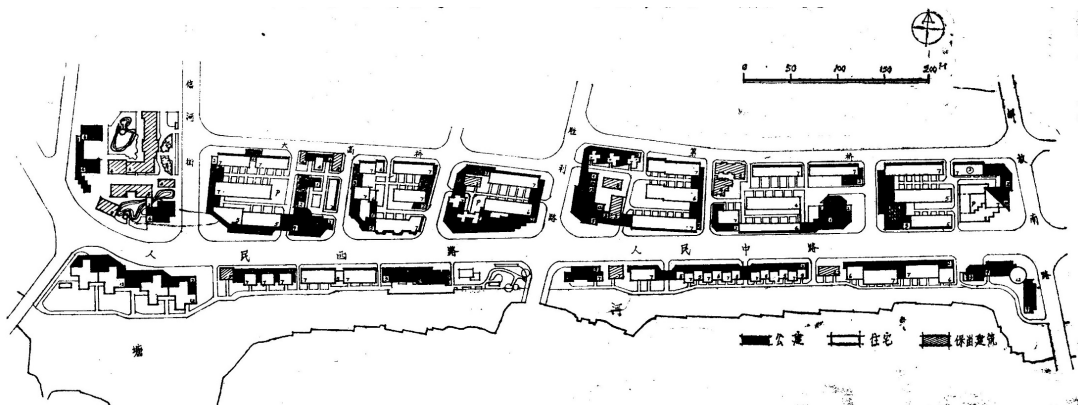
Middle and West Renmin Road Detailed Planning, 1987
